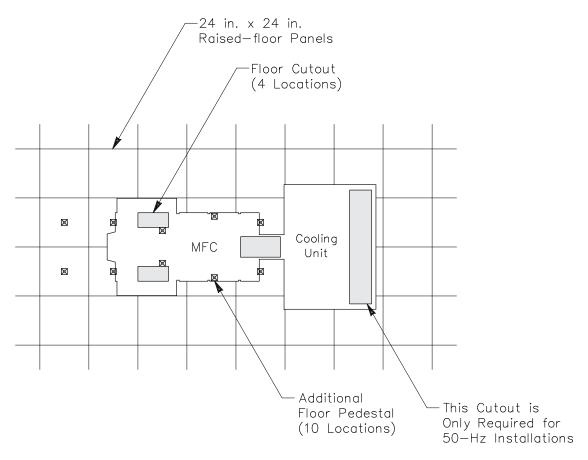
CRAY T3D MCA Floor Plan on 24 in. x 24 in. Floor Panels
